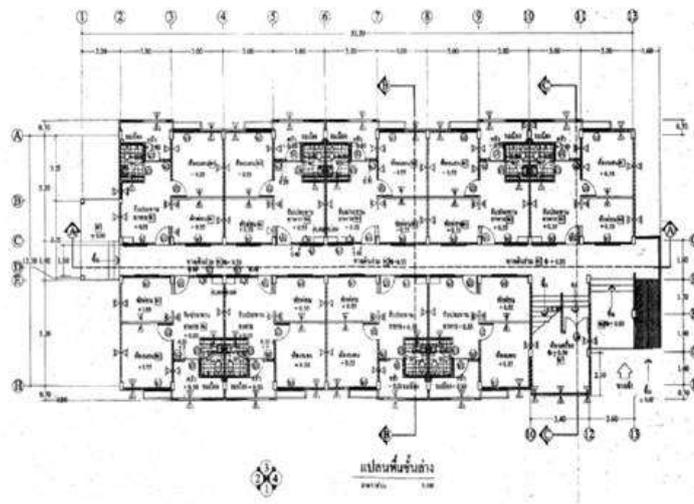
Ground Floor Layout of Typical Low-Rise Condominium
